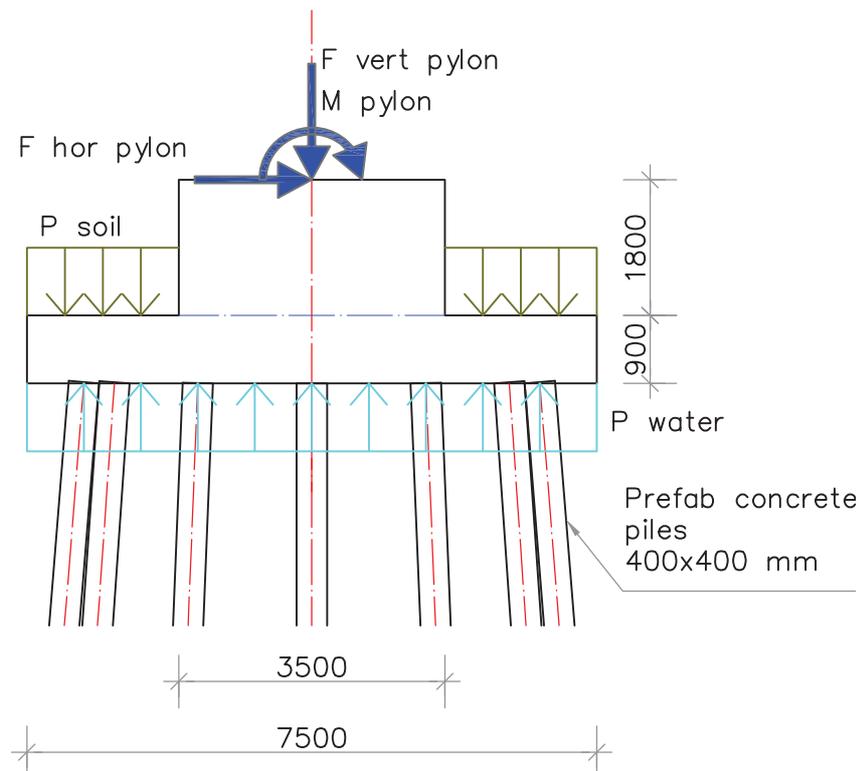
Cross section of the foundation structure with acting loads which are taken into account
